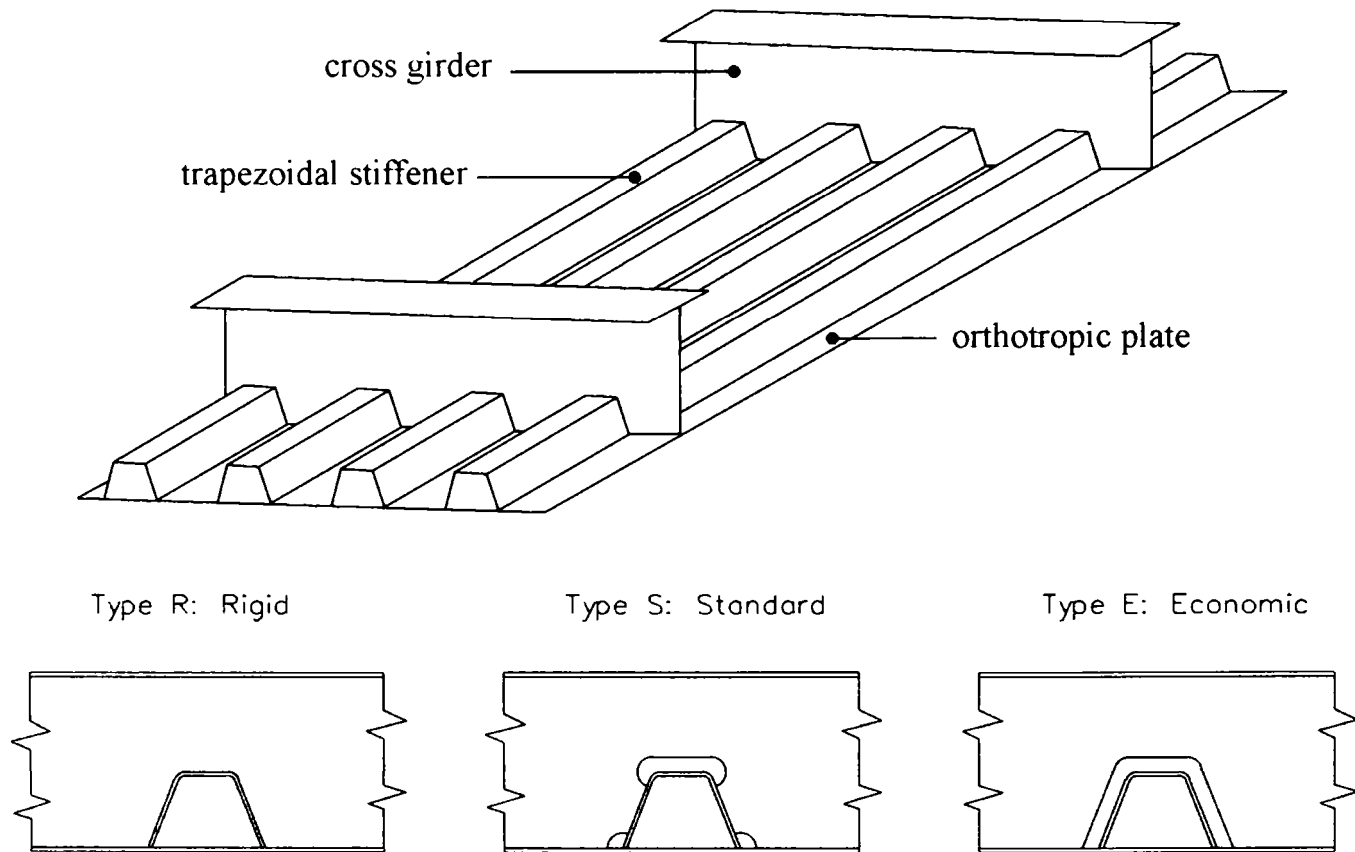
Connections of trapezoidal stiffeners and cross beams
